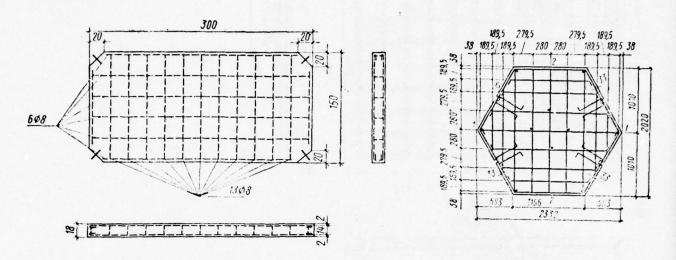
Design of reinforced concrete slabs for a road pavement in the area of the city of Pavlodar.
